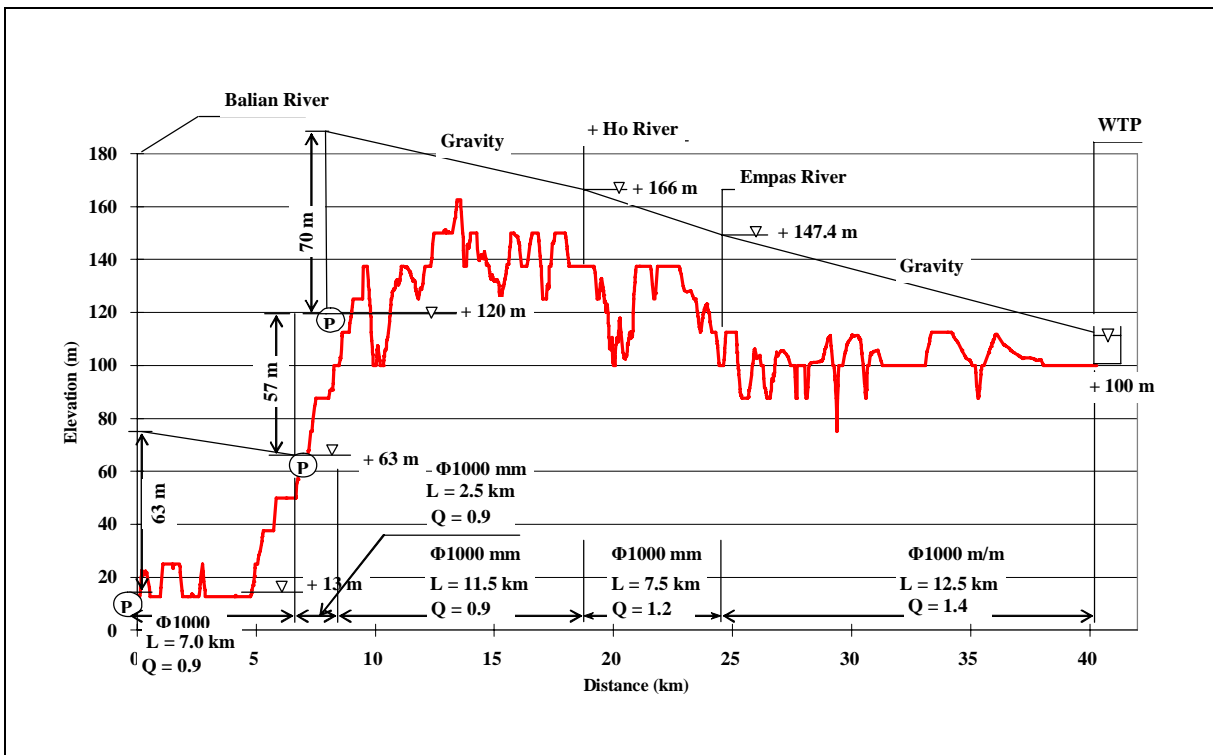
Longitudinal Section and hydraulic Gradient Line of Alternative C3
